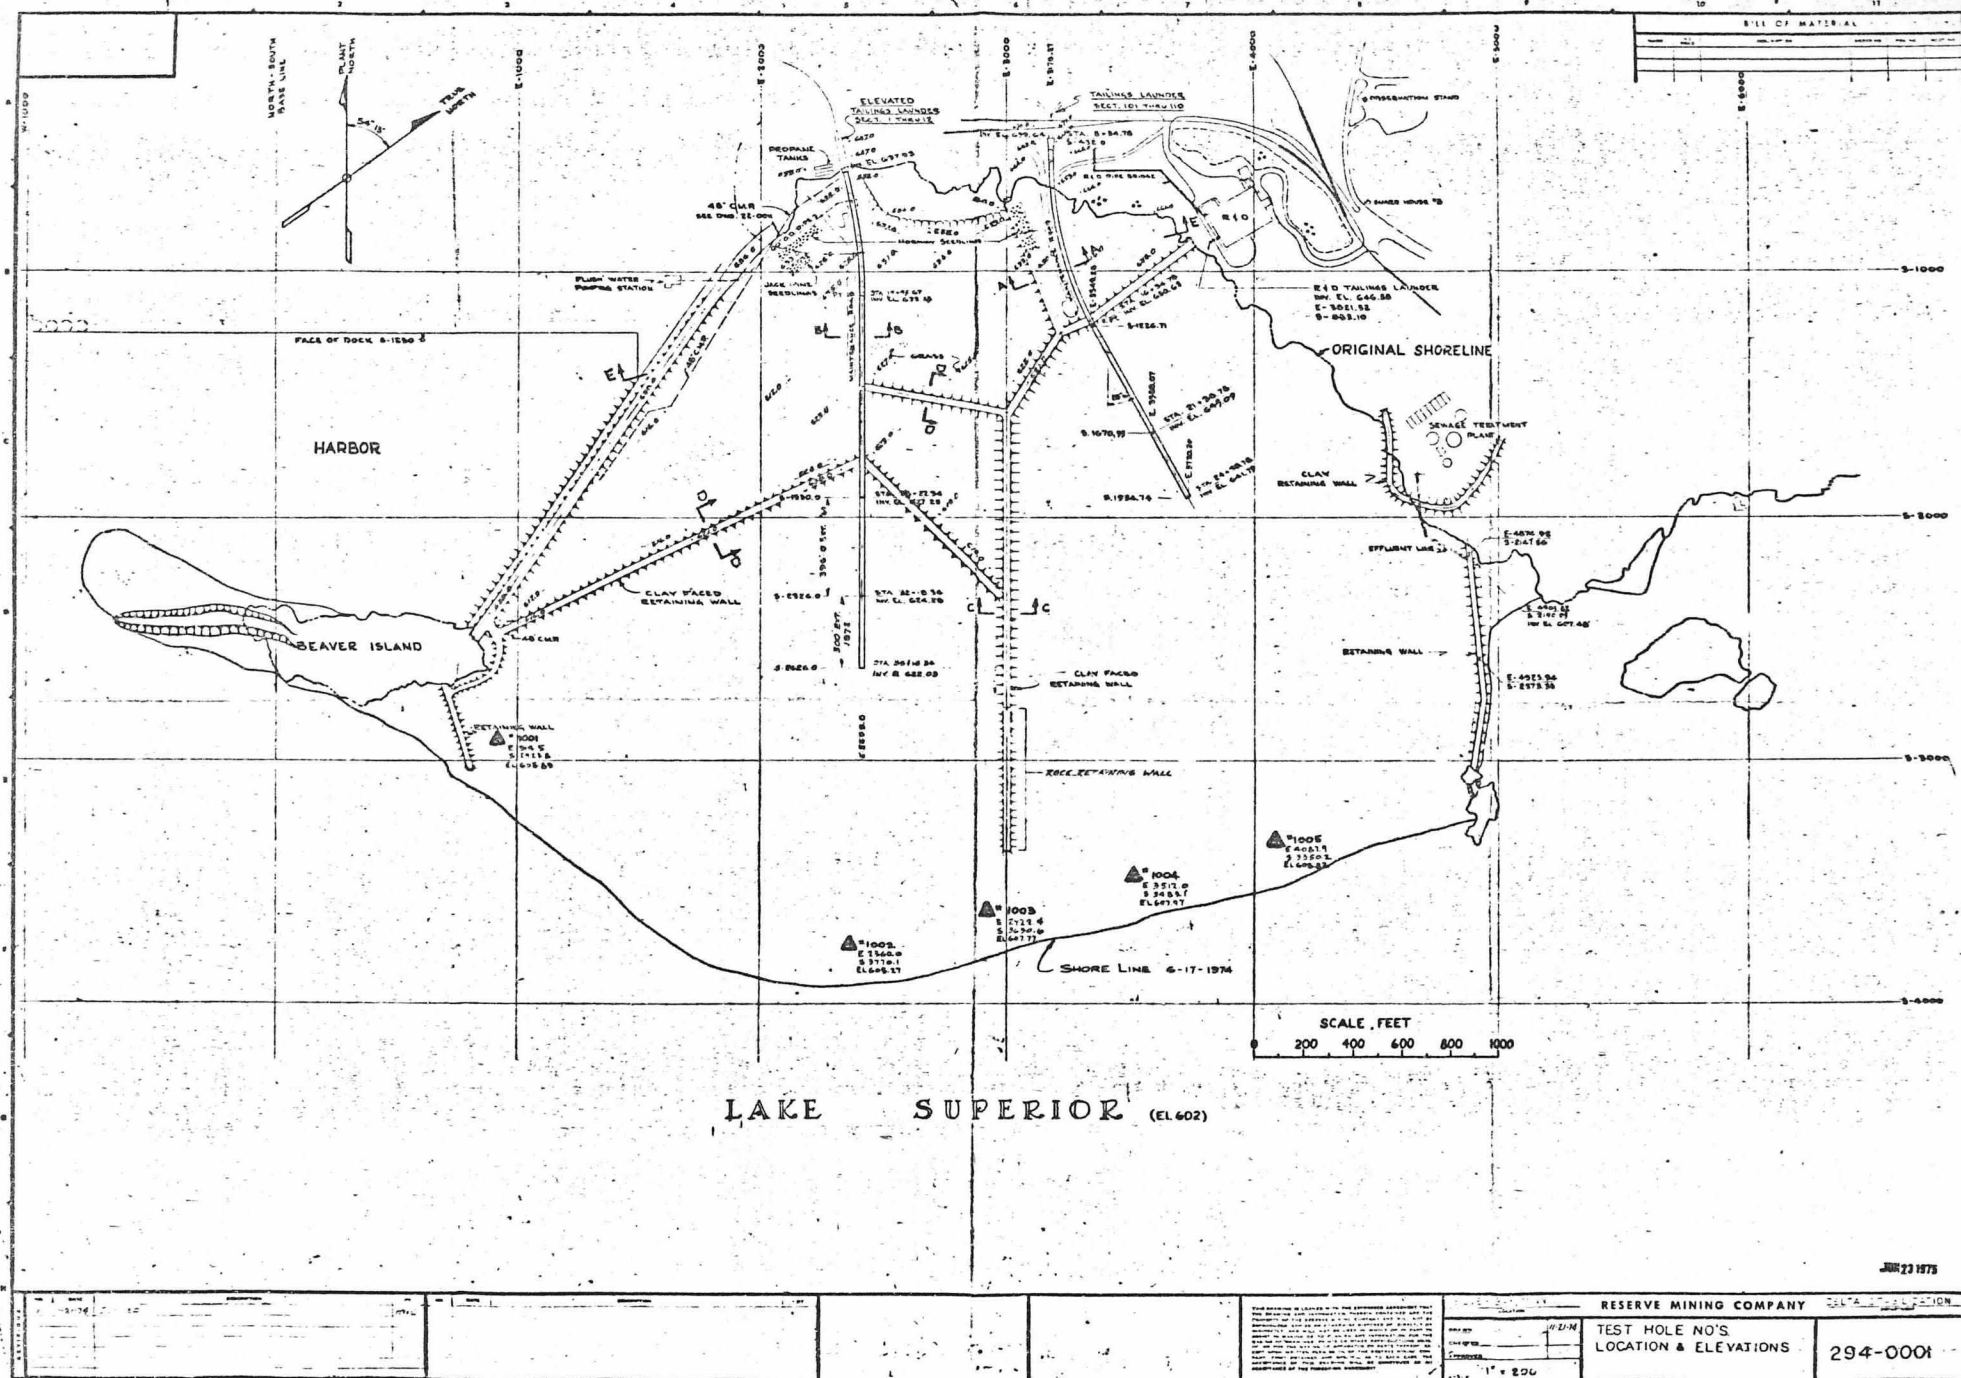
LOCATION PLAN OF BORINGS ON TAILINGS DELTA
